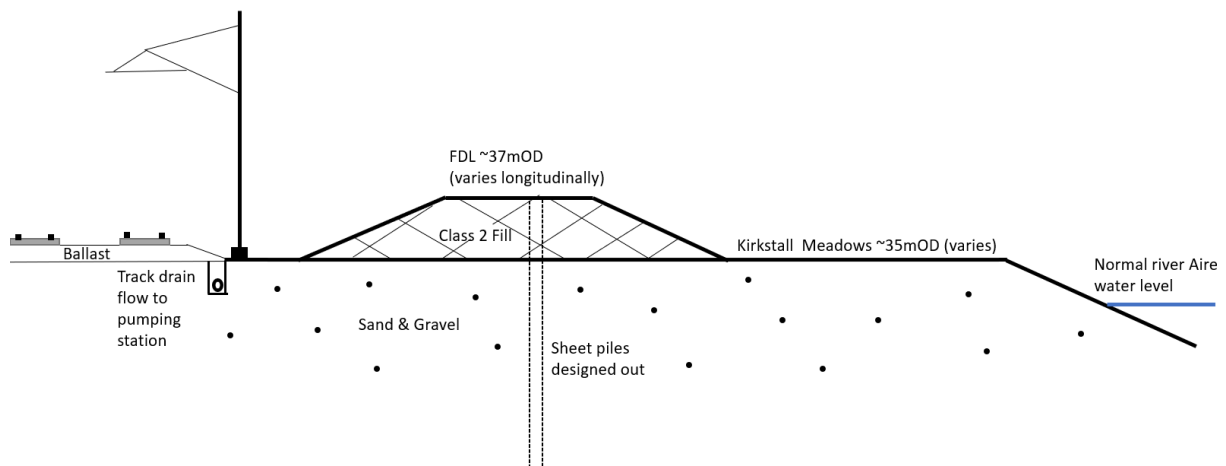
Typical section of new flood defences at Kirkstall Meadows.
